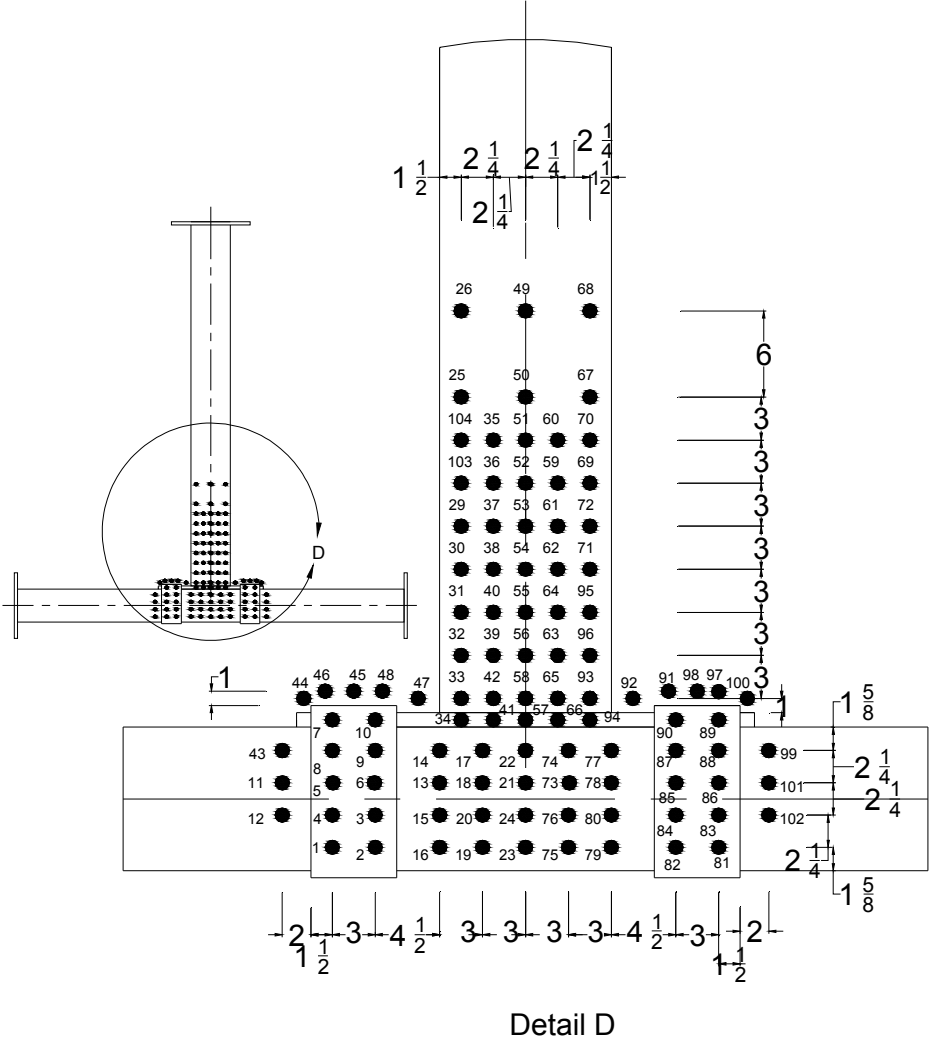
Optotrak Numbering Scheme for Collar Connection without Stiffeners (units in inch)
